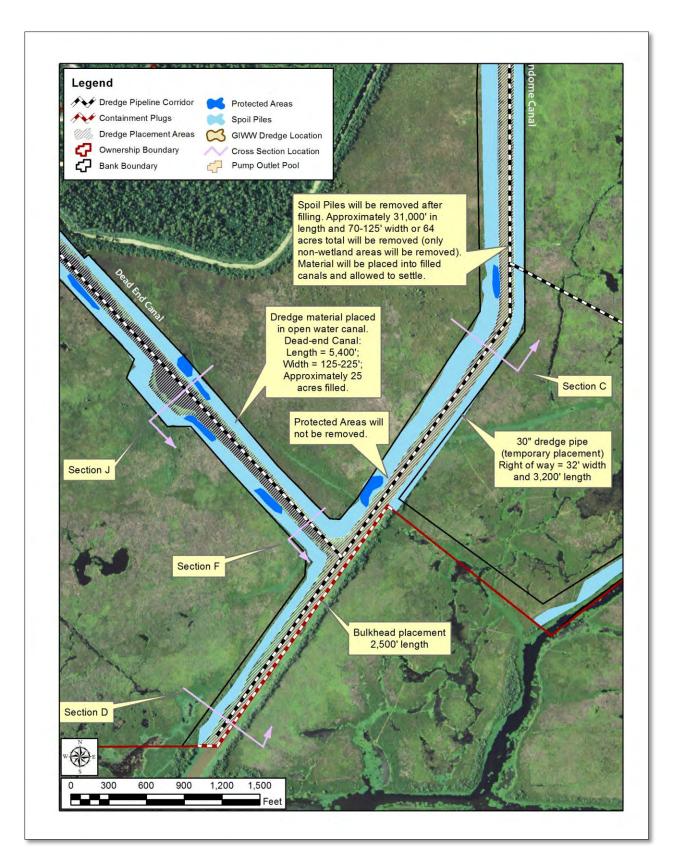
Dredge Placement, Pipe Location, Cross Section Locations, and Spoil Piles.
